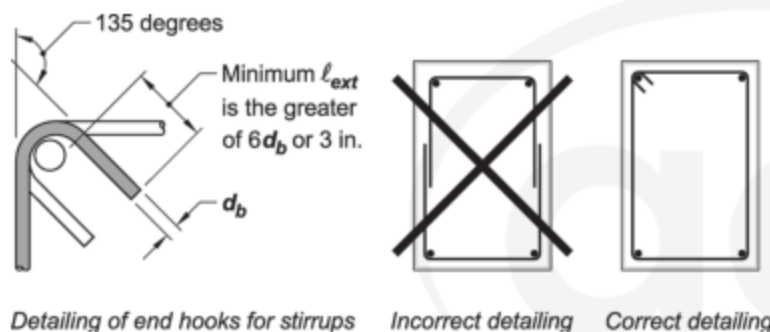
Detailing of closed stirrups for torsion.
